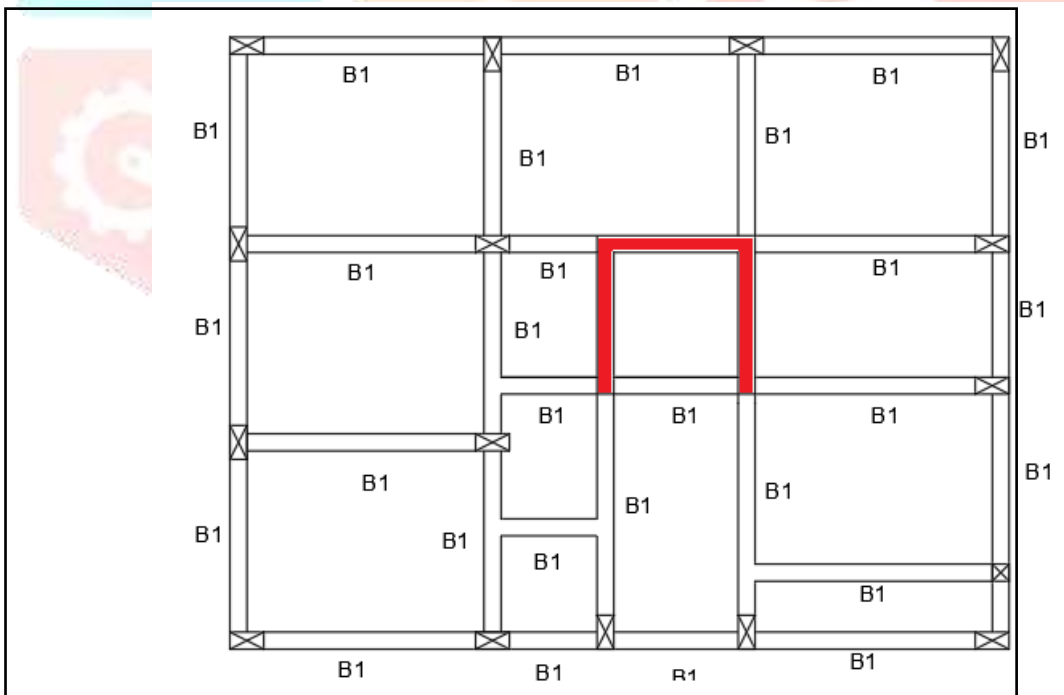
Shear Wall at Three periphery sides of lift Auto-Cadd Plan
